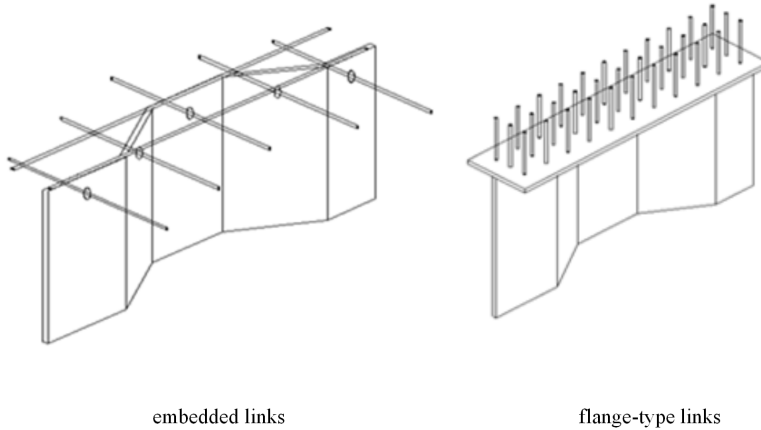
Schematic diagram of common connections for corrugated steel plates and concrete slabs
